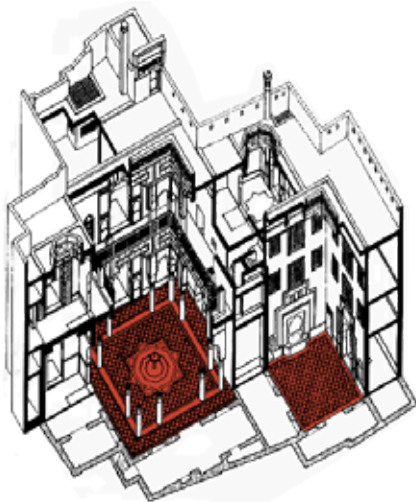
Typical Islamic house, Double courtyard, Axonometric Section. Made by author
